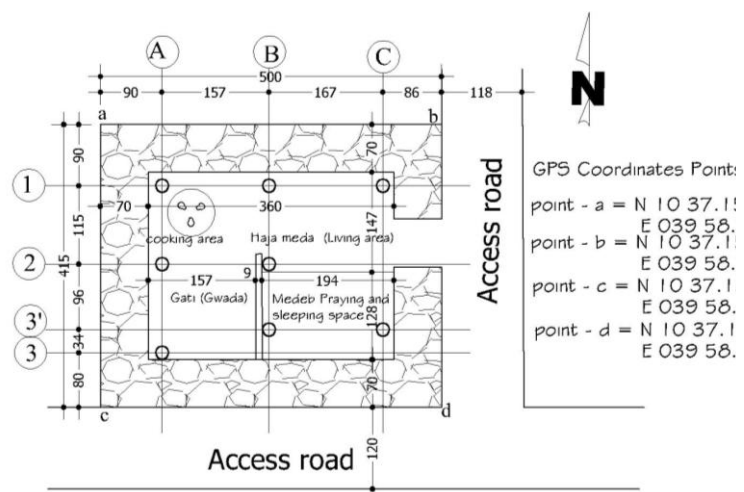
256 Floor plan of W/ro Sofiya Aliyu derb
